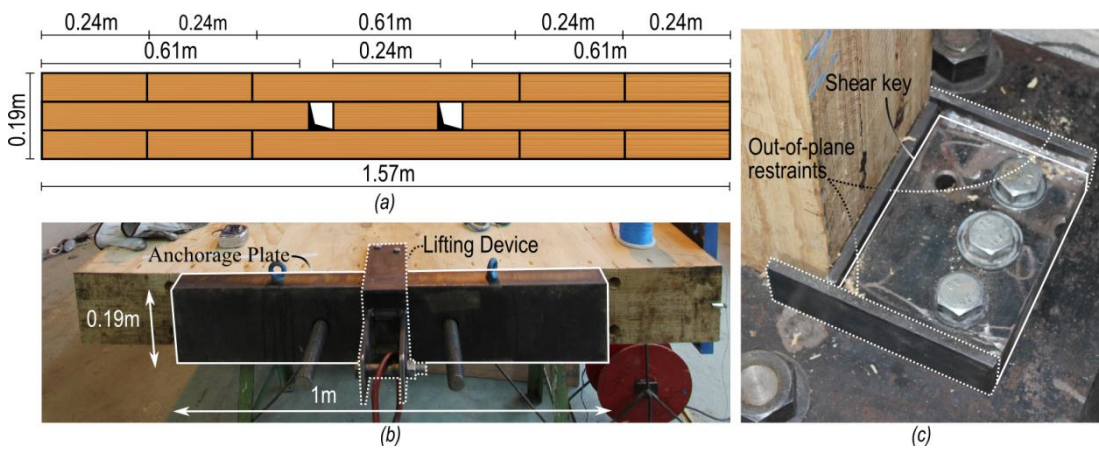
(a) Wall section. (b) Post-tensioning plate detail; (c) shear key
